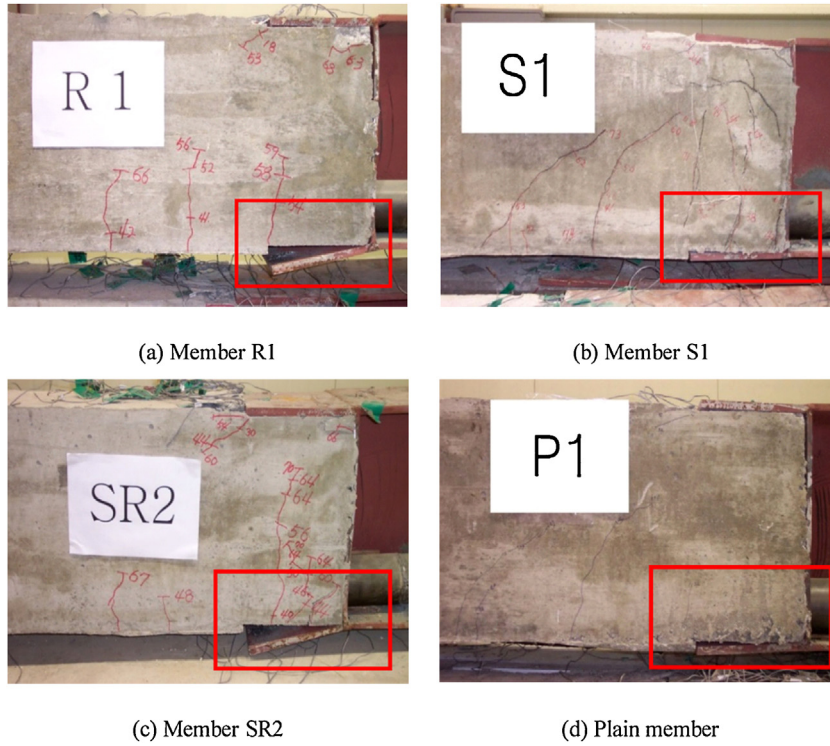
Failure patterns of hybrid girder test members.
